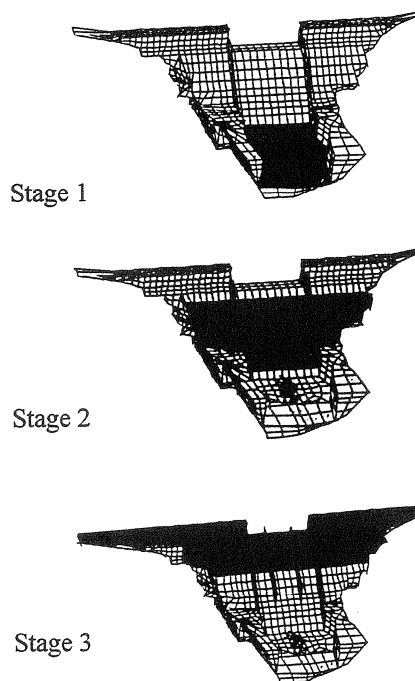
23m dam raising stages - the new concrete elements are shown as shaded.
